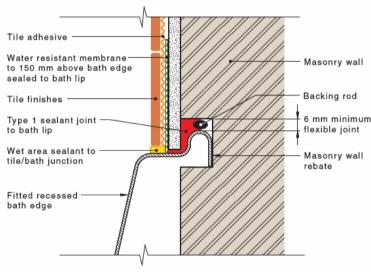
(A) — Bath with no shower over it — Fitted bath — Masonry wall
